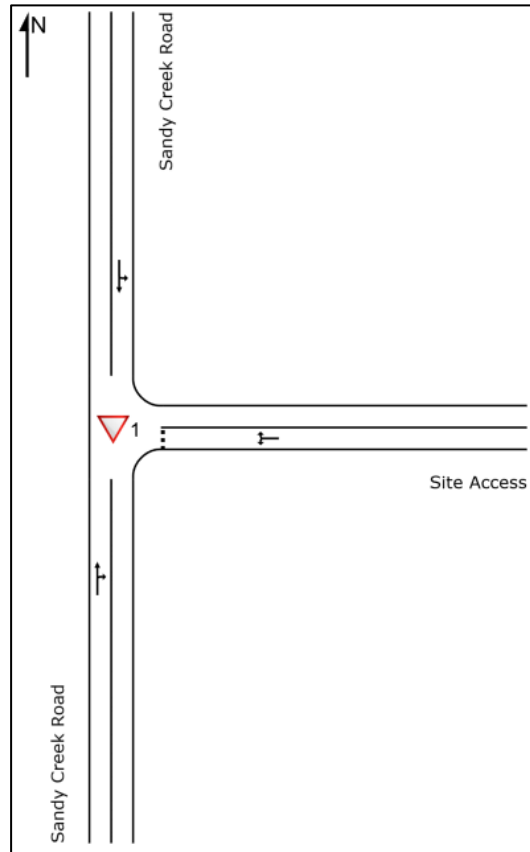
Modelled Existing Configuration of the Sandy Creek Road Site Access
